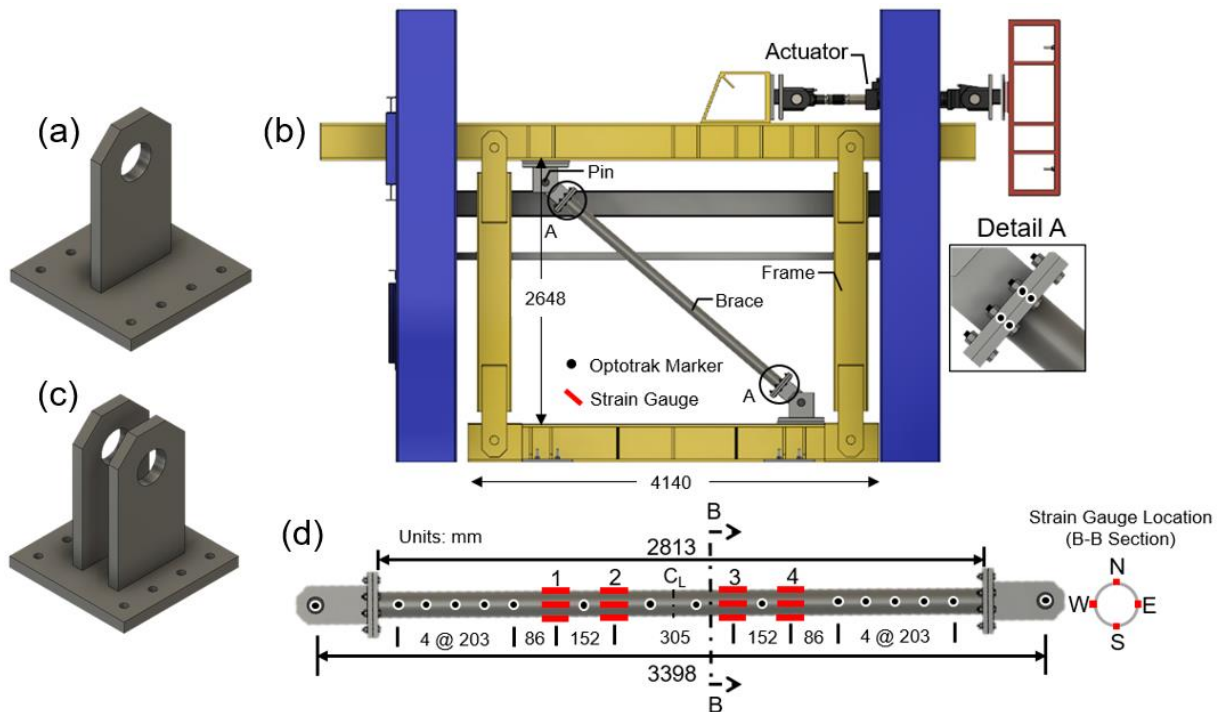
Drawing of the UM test setup including the (a) single plate pin connection, (b) load frame, (c) double plate pin connection and (d) brace instrumentation
